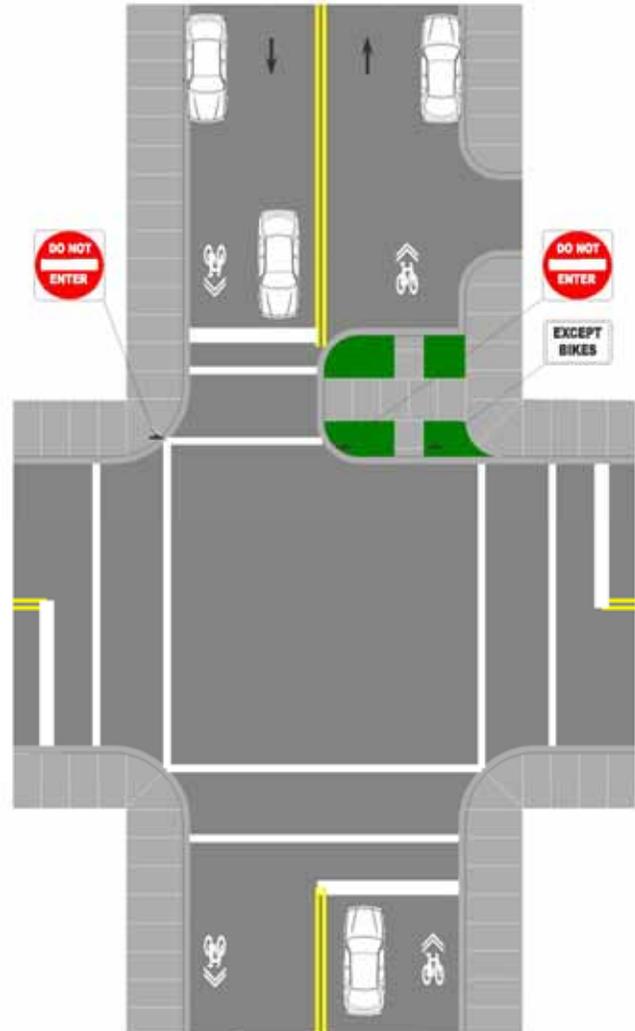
Example Restricted Street Entry/Curb Extension on a Shared Roadway
